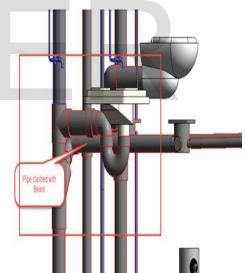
Clash bet. Pipe (green) & Str. beam(red) Fig.10.Resolving clash bet. pipe and beam by Changing slope of pipe
